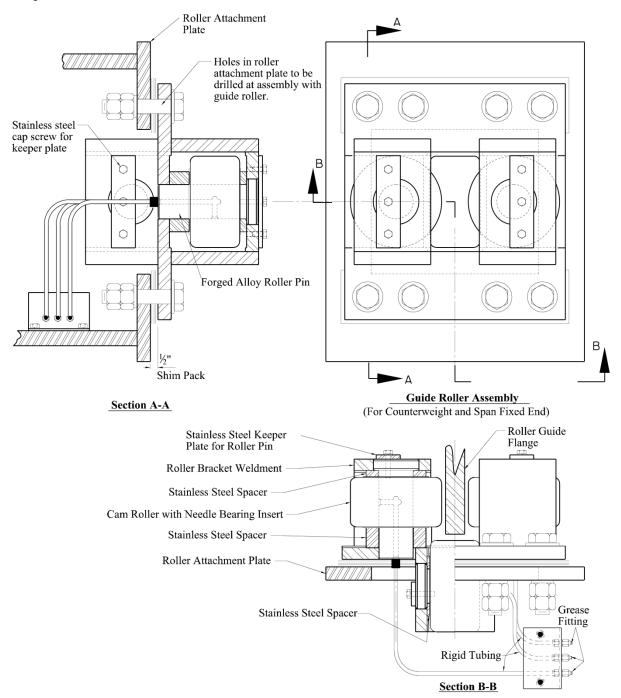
Example of a Vertical Lift Bridge Guide Roller Assembly for the Fixed End
